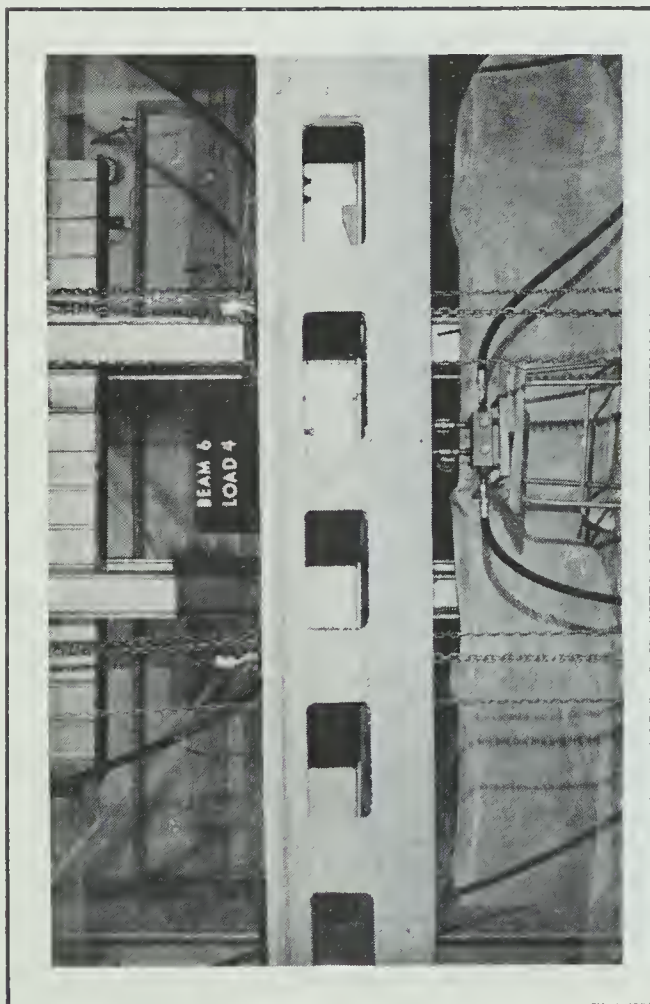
BEAM #6 CRACKING AND FAILURE PATTERNS
